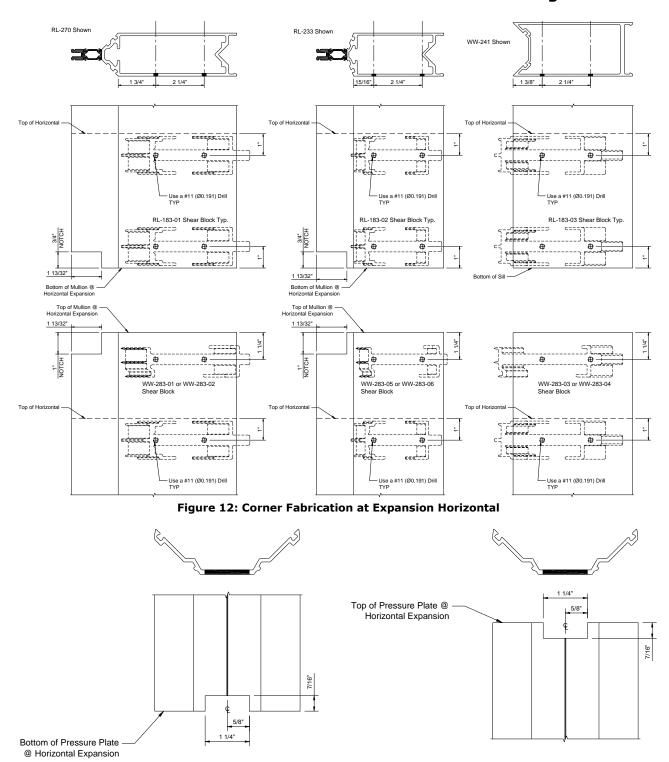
RL-164 Pressure Plate Fabrication at Expansion Horizontal
